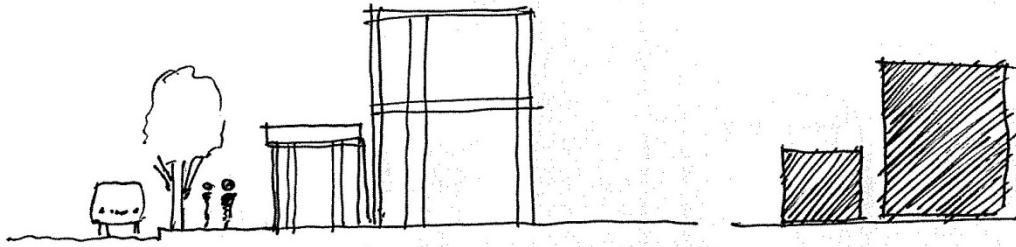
Building setback facilitated by building precluding embassy. The buildings contain separate structures. Image by author. Hopper, 2005, 45.
